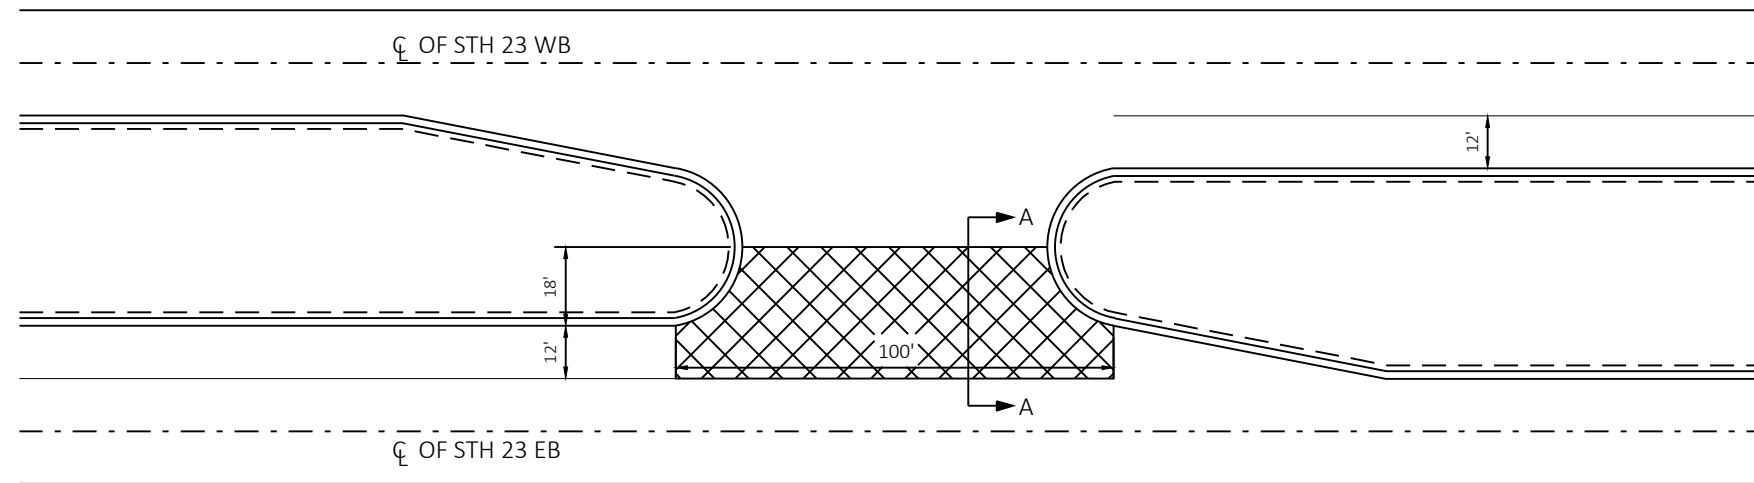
DETAIL FOR ASPHALTIC SHOULDER AT BEAM GUARD
